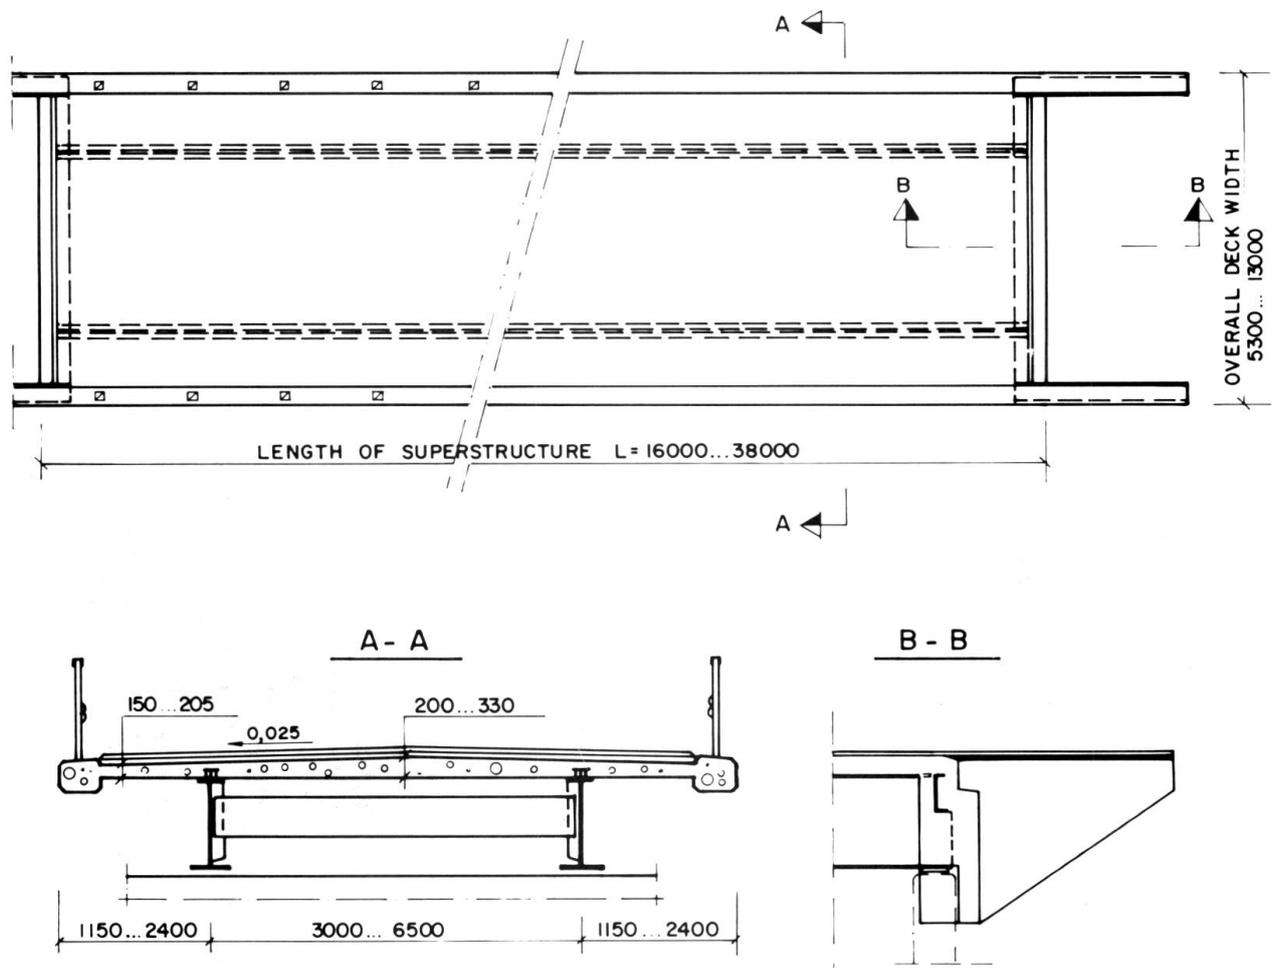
Standard steel girder bridge. Main dimensions. In situ deck slab.
